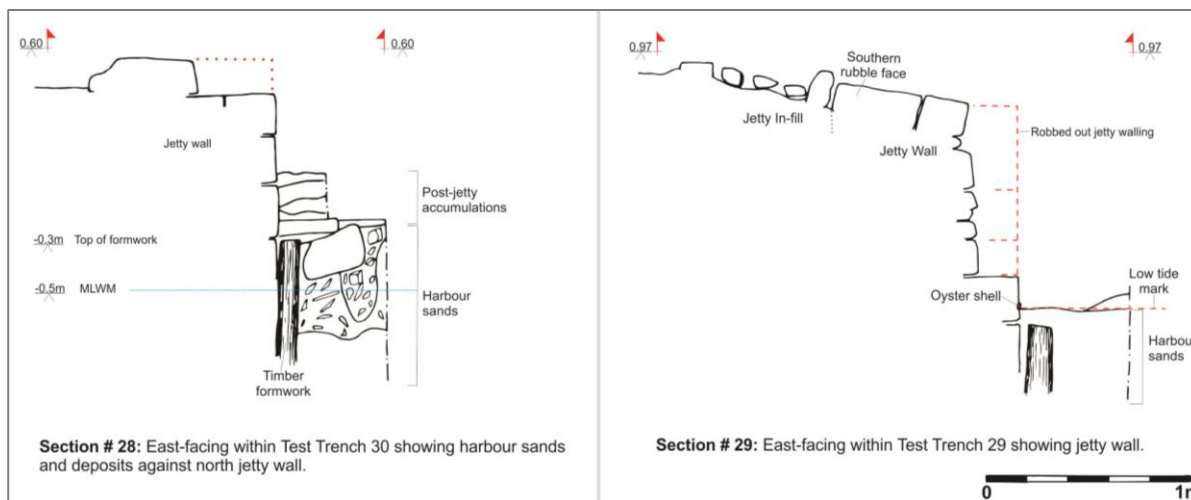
East-facing sections (Section #28 and 29) through the sandstone jetty wall, showing also the timber formwork and harbour sands. Extract from Vol 4: Plan 10.12.
